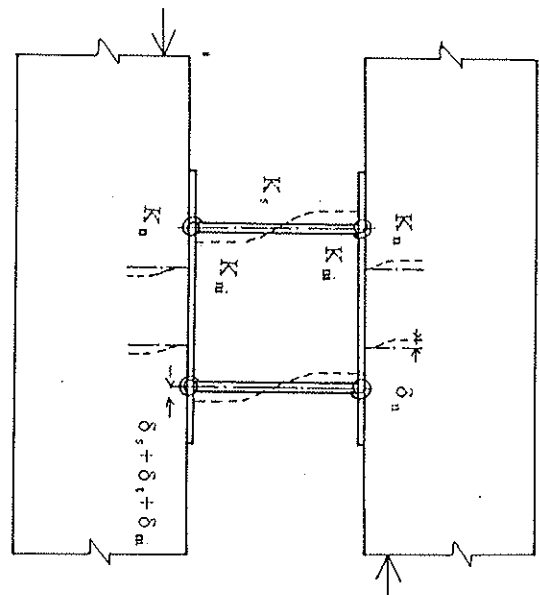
Shear-deformation model for connection spacing upper and lower chord members of built-up timber beam.
